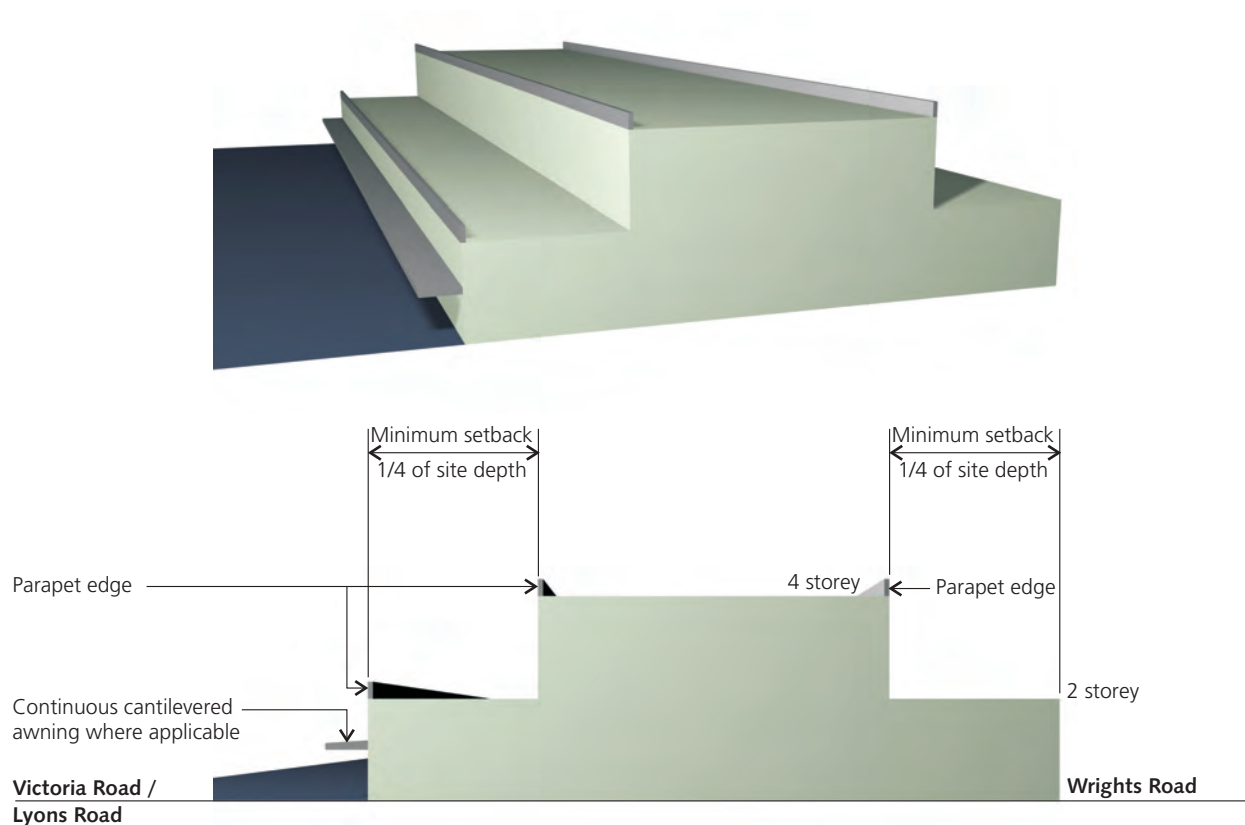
3D envelope for Victoria Road / Lyons Road / Wrights Road - 4 storey building
